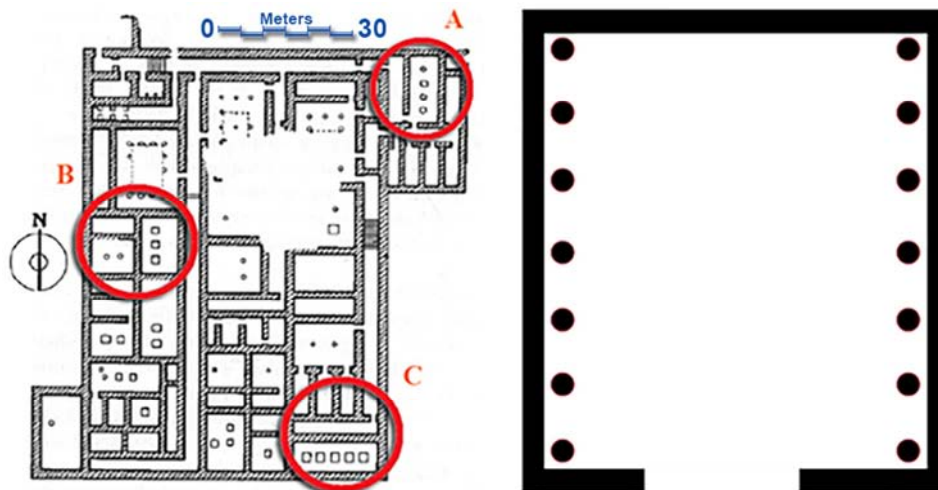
Left: Is showing a schematic plan of a large ancient Egyptian house found in the Illahun area of Tell El-Amarna, in southern Egypt. Right: Shows a typical Hall design with columns on its side walls used either for decorating walls, or for carrying the hall ceiling. Left and right images were compiled and annotated by the research. Reference: [11].
